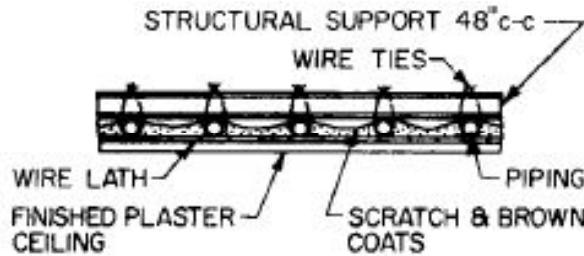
Pipe embedded in a plaster ceiling for radiant heating.
